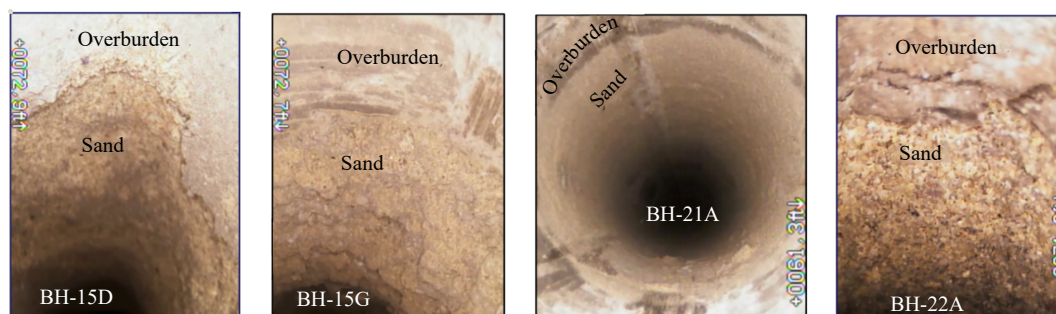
Verification boring results showing tight contact between the final sand backfill and the roof or crown of the underground void opening.
